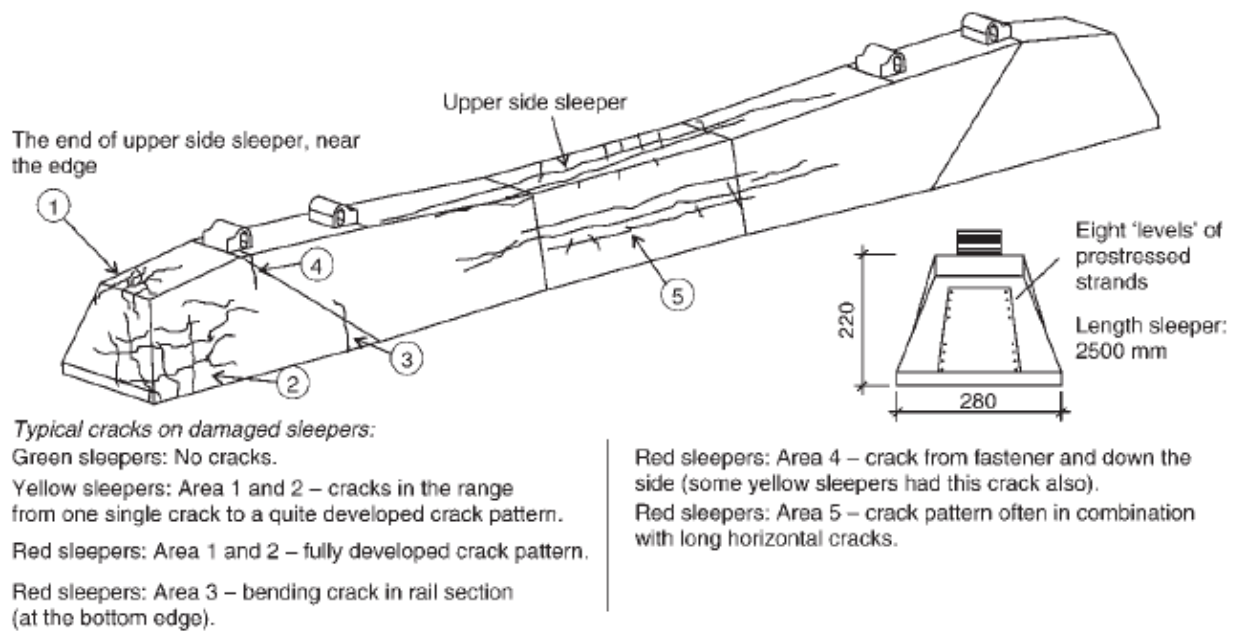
Drawing of a Typical Damaged Concrete Crosstie with Characteristic Cracking Pattern Classified (Thun et al. 2008)
